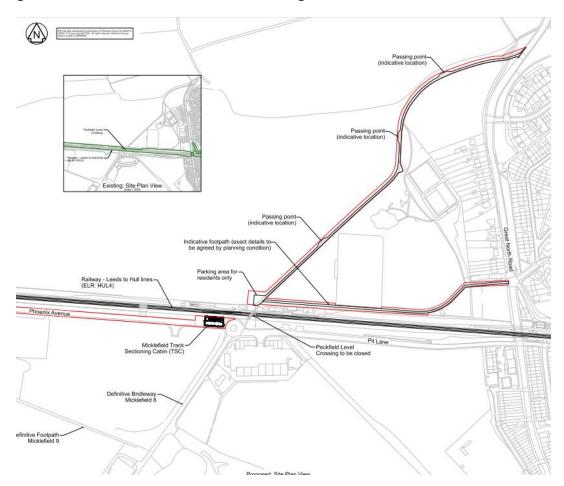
Site layout plan of Peckfield Level Crossing Closure and Micklefield TSC
